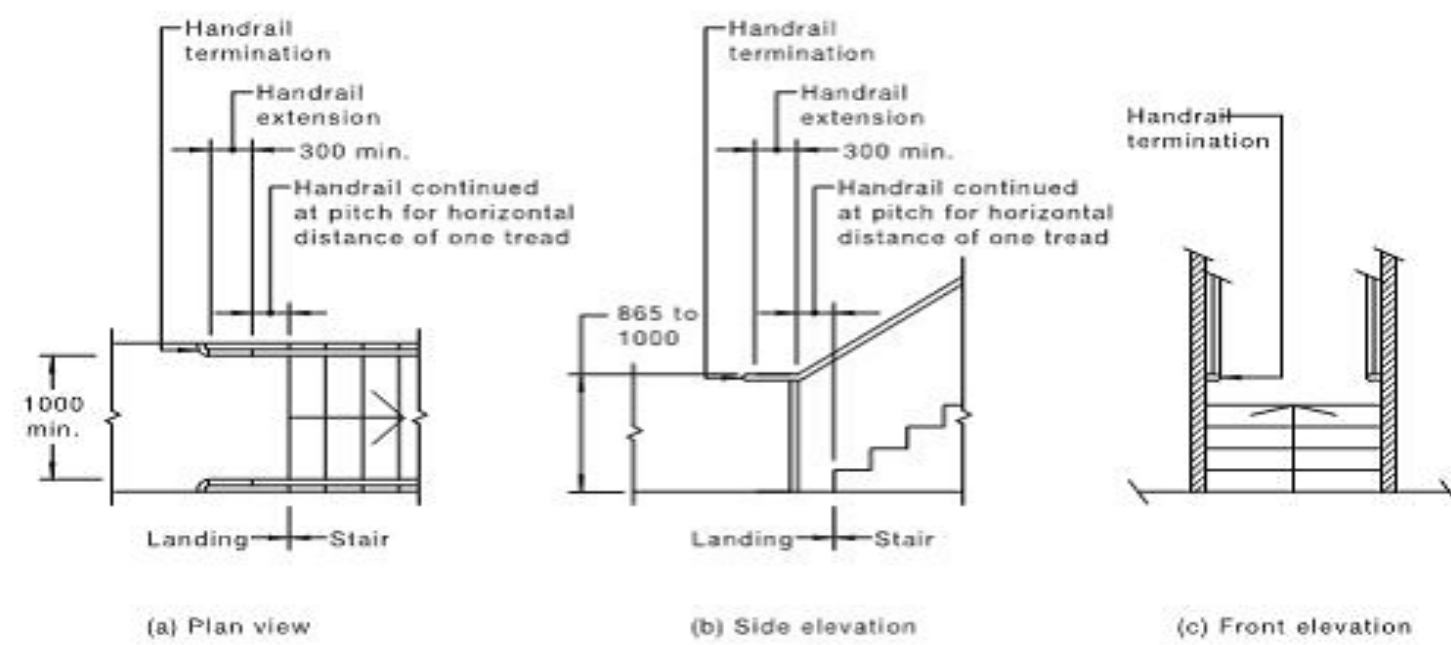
(C) STAIR HANDRAILS—HANDRAIL TERMINATIONS
